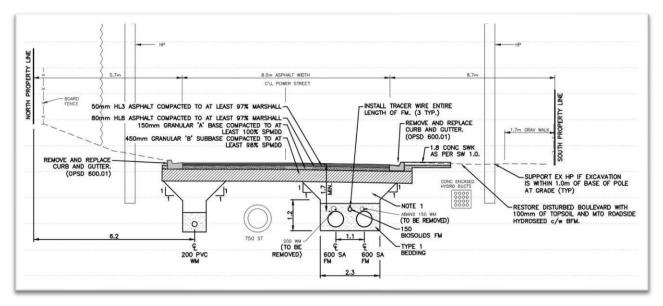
Typical Trench & Bedding Details for multiple mains in a road
